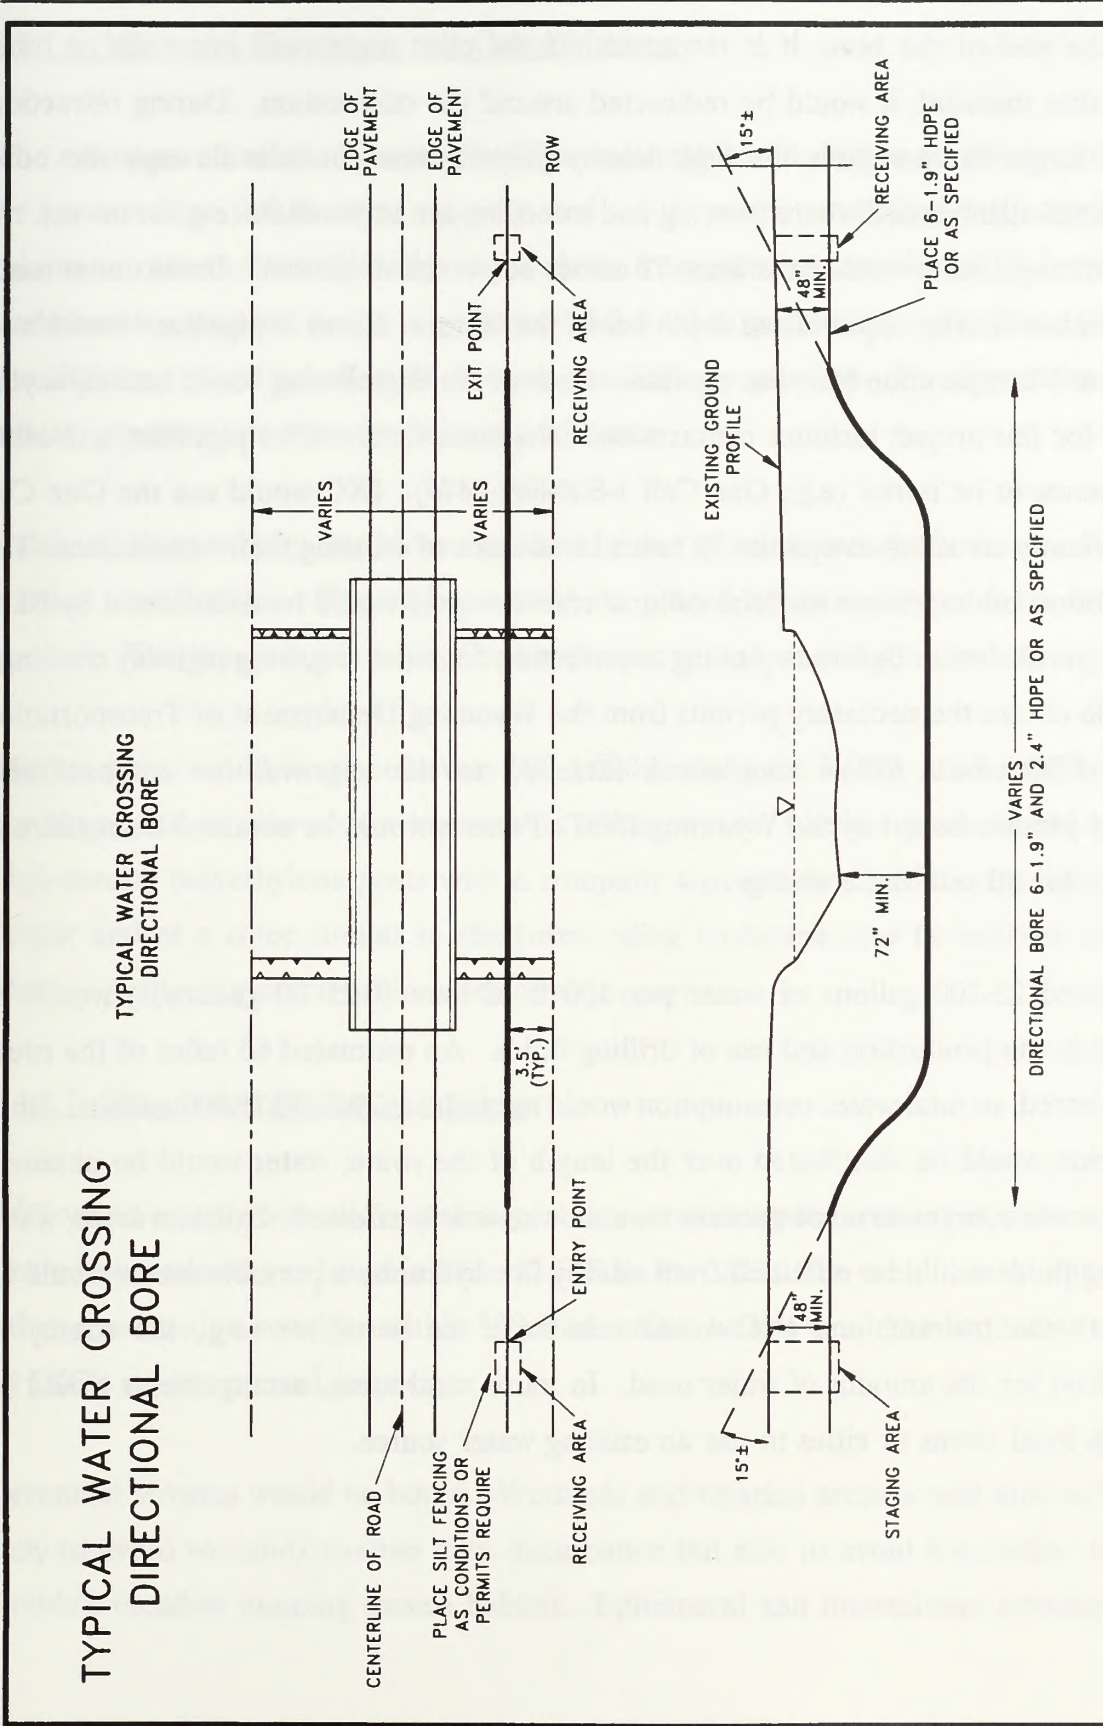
Cross Section: Water Crossing Boring. Other Borings Would Be Similar; Details Are Provided in the Plan of Development.
